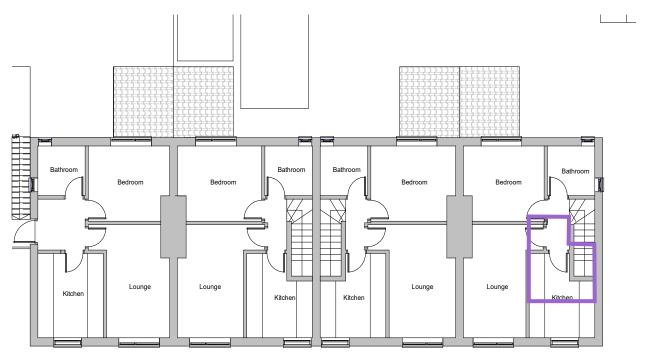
Floor plan highlighting the kitchen which does not meet the BRE's recommendations for NSL (purple).
